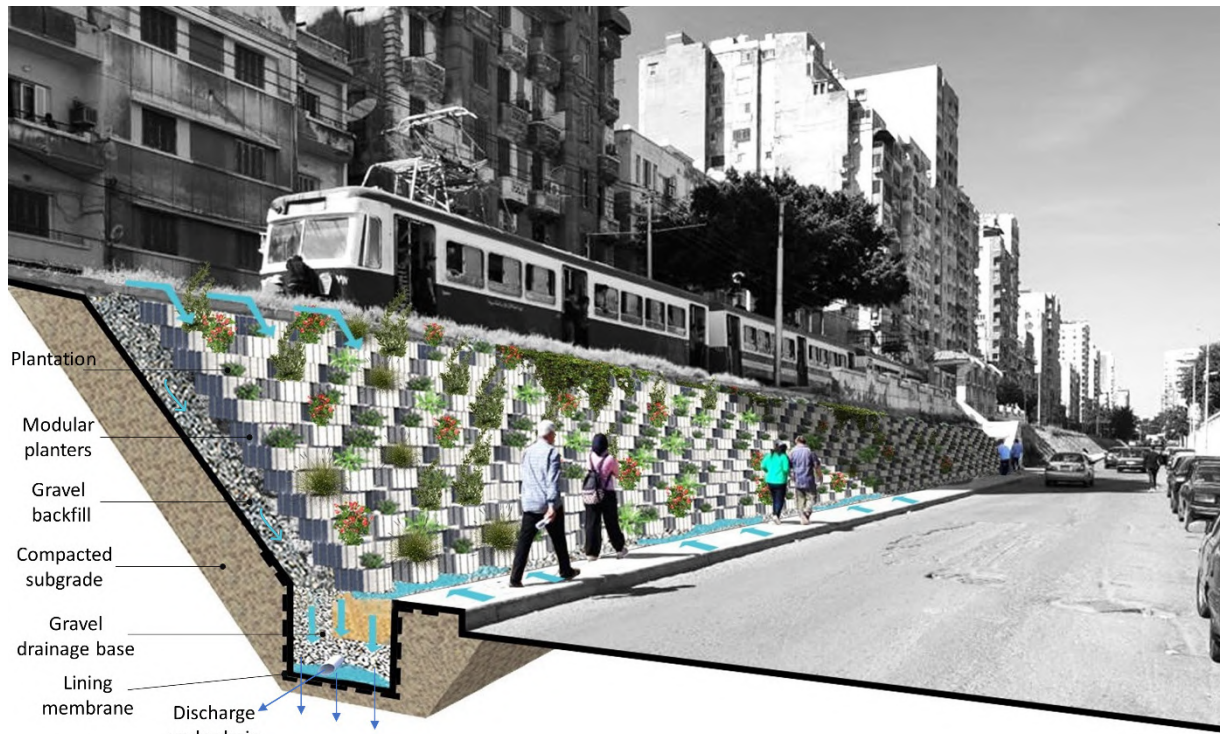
Proposed integrated concept of bioretention street planter and modular retaining wall blocks system for upper tram profile.
